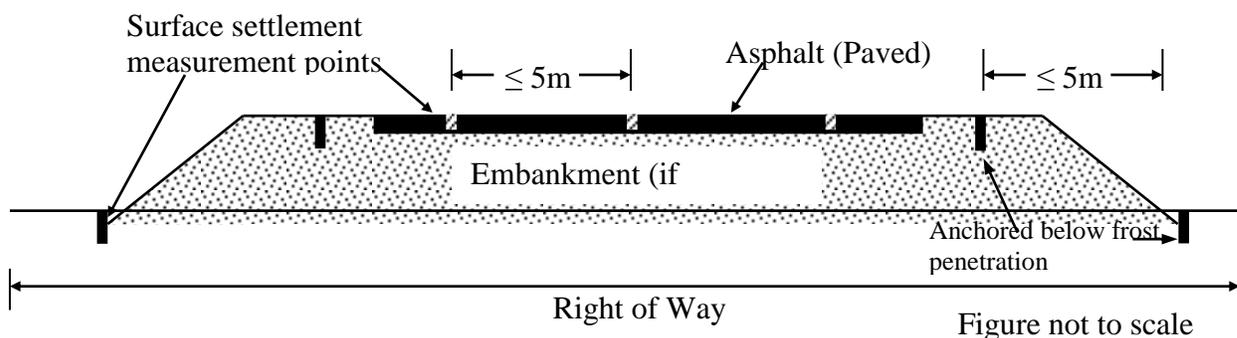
Typical configuration of surface settlement monitoring points along the tunnel alignment.
